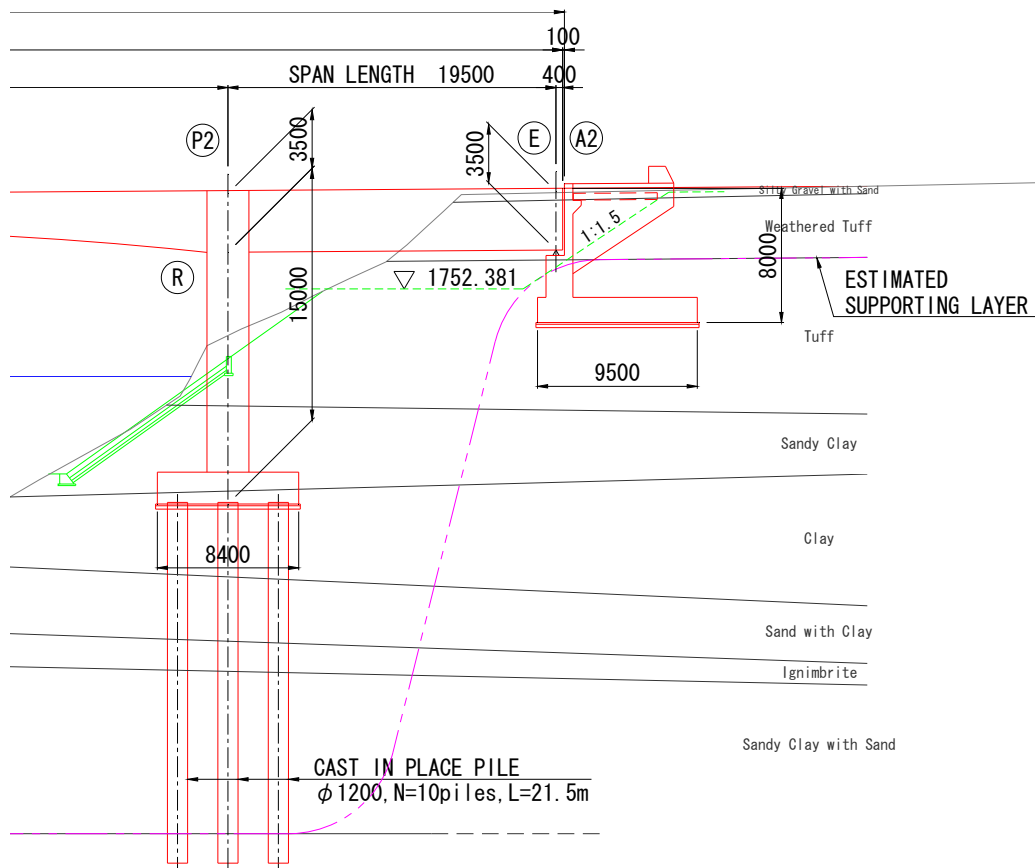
Shape and height of the substructure works (2/2) (Modjo Bridge)
